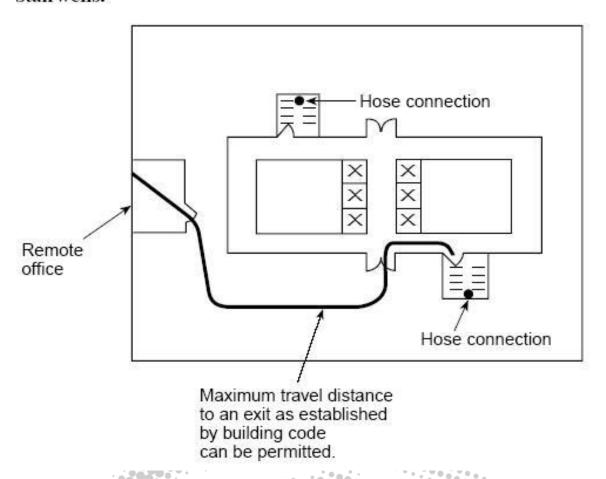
(c) Location of hose connections in exit passageways.
